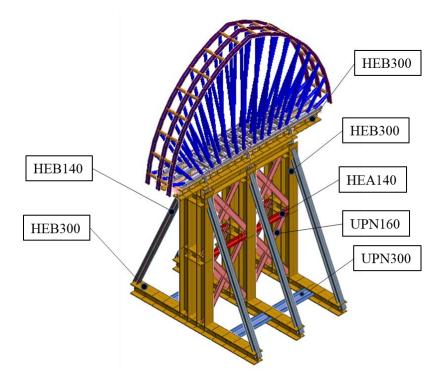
FE model of the steel frame and ribs of the unloading-reloading system.
